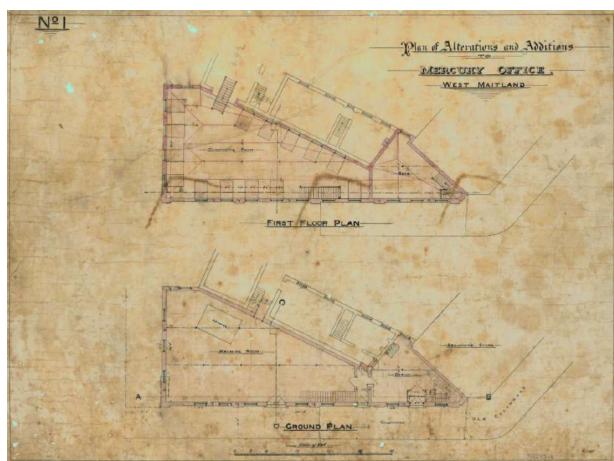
Plan of Alterations and Additions to the Maitland Mercury Office West Maitland, NSW, 31 December 1881
